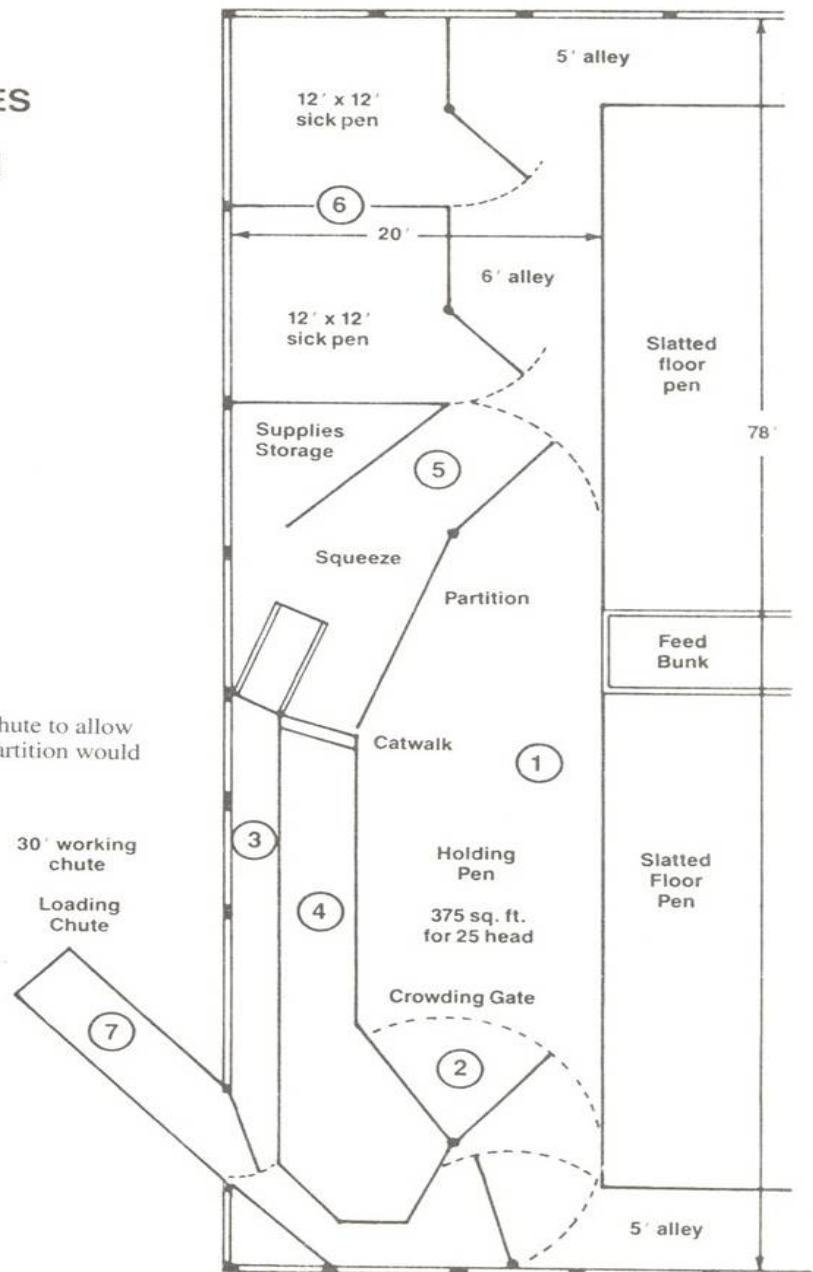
General layout for covered handling facilities. OMAFRA Engineering Unit
